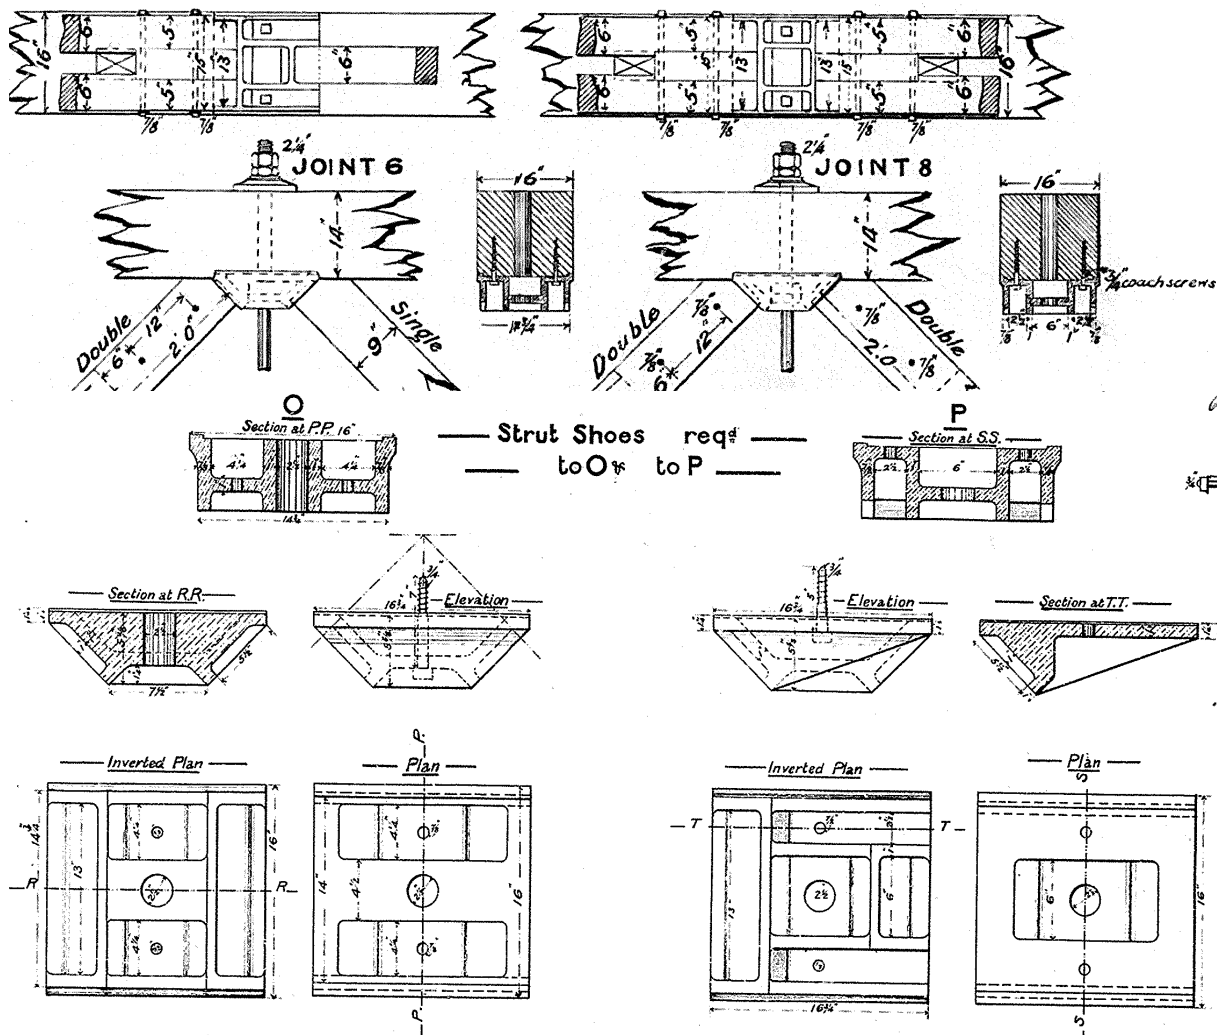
Plan of Cast Iron Shoes at tops of Diagonals in 90' McDonald Truss at Tarraganda
